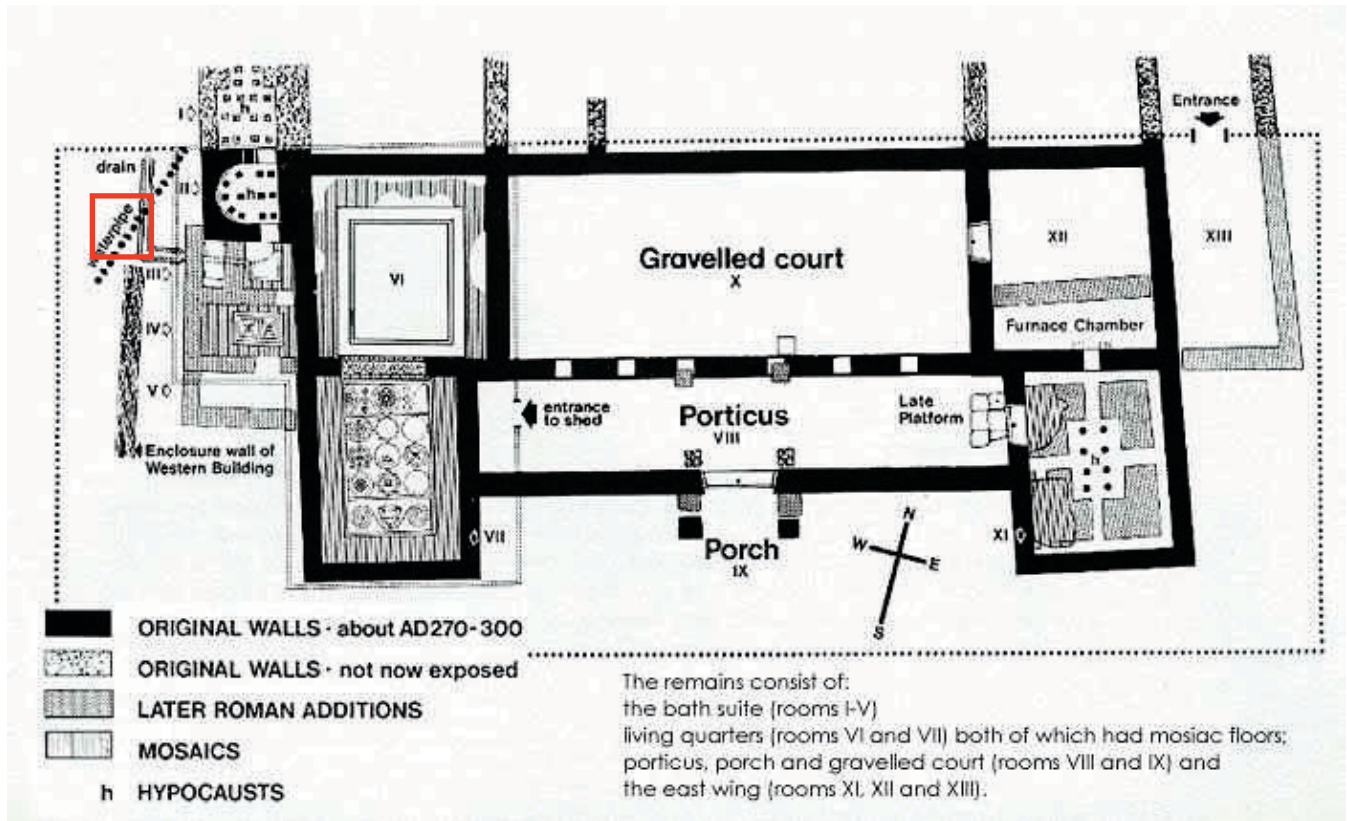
Villa ground plan (after Boon 1950) and trench position in red
